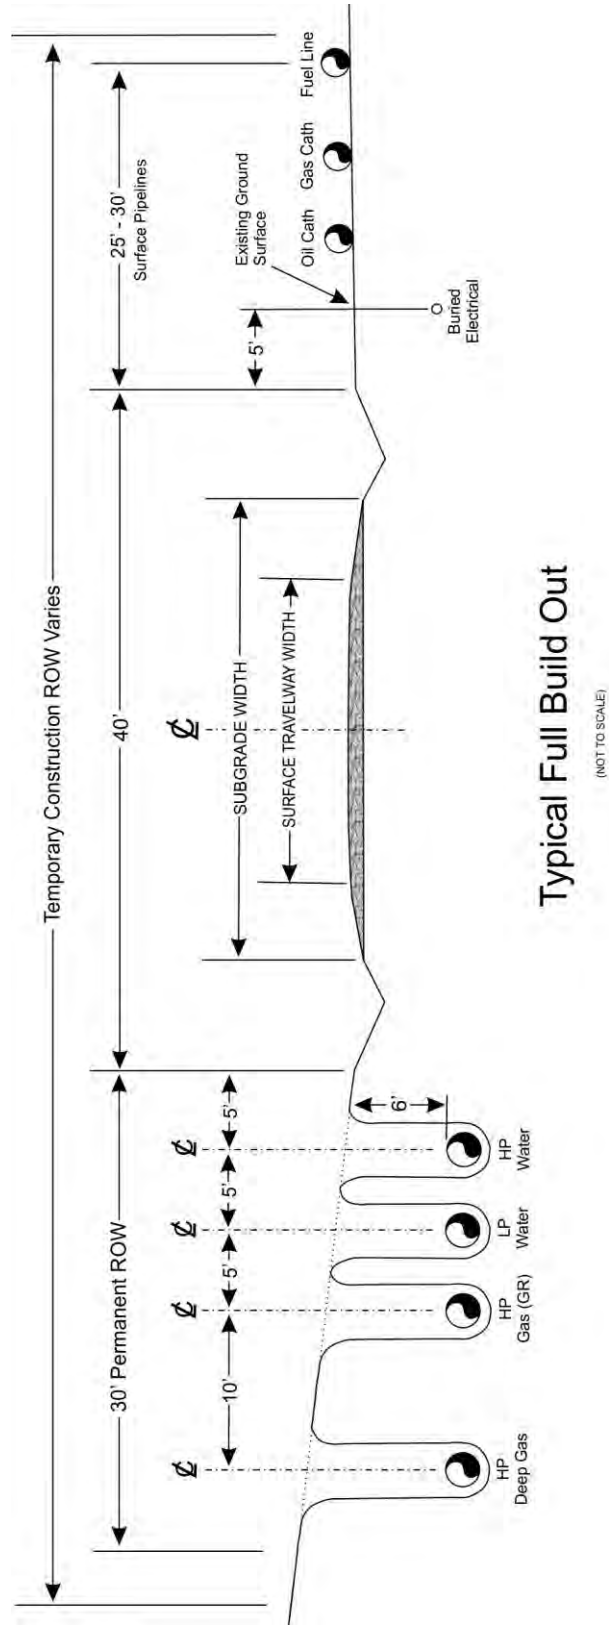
Typical Roadway Cross Section with Width Specifications
